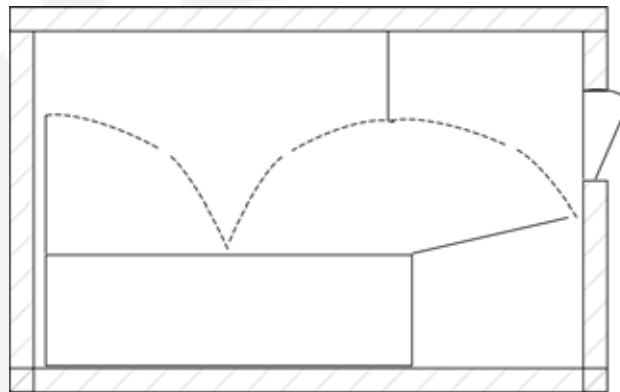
TYPICAL WORKING SPACE REQUIREMENTS AROUND FREE-STANDING SWITCHGEAR (LOW VOLTAGE).
